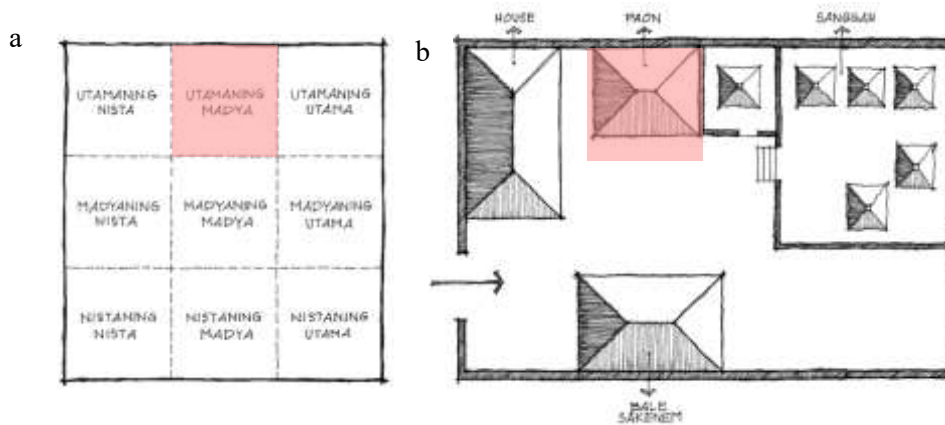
(a) The Sanga Mandala Concept; (b) Site plan of Penglipuran houses.
